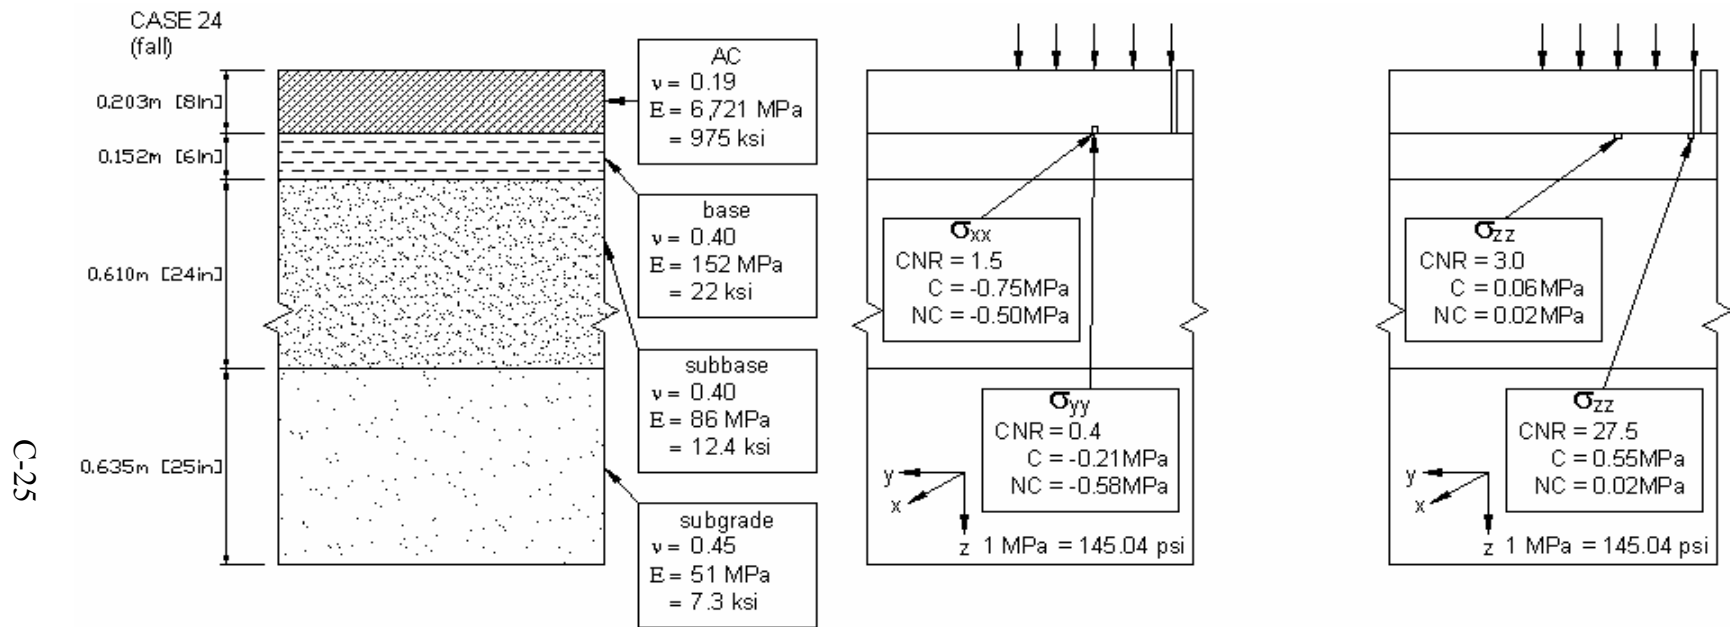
Summary cross section for case 24, (C – stress in cracked pavement, NC – stress in pavement with no crack, CNR – crack/no crack (stress) ratio)
